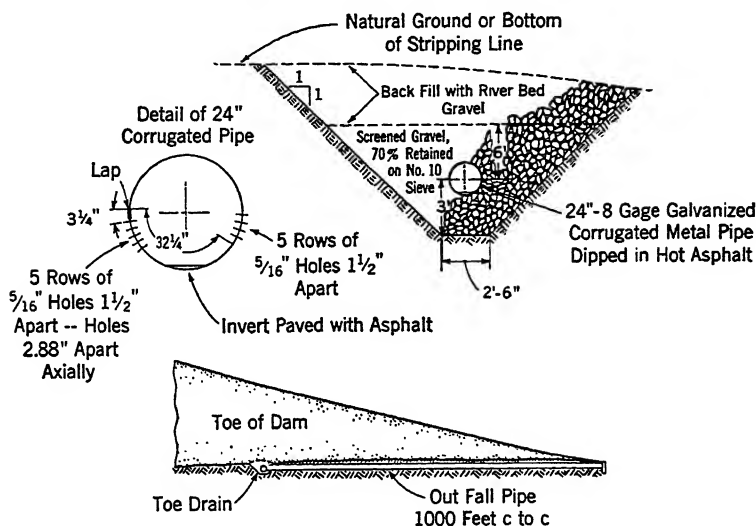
Galvanized iron asphalt-dipped pipe drain as used at Kingsley Dam, Nebraska
